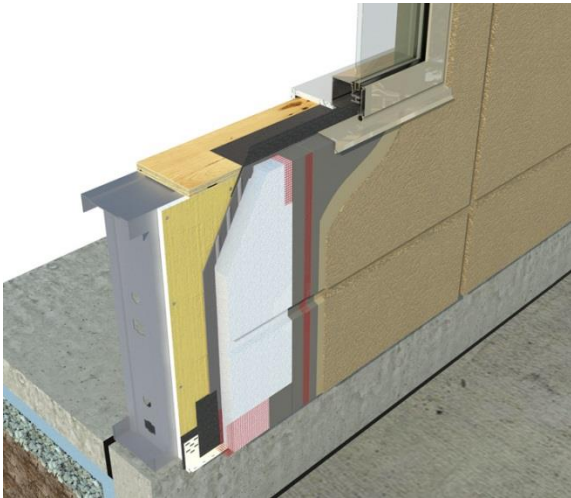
“Adex-VCA” system with a water penetration barrier over glass-fibre-faced gypsum
